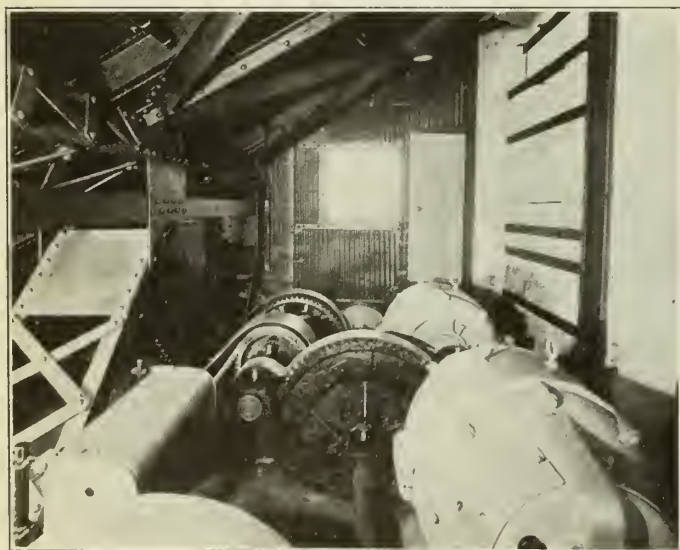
Bridge No. 3—View Inside Machinery Enclosure on Leaf.
